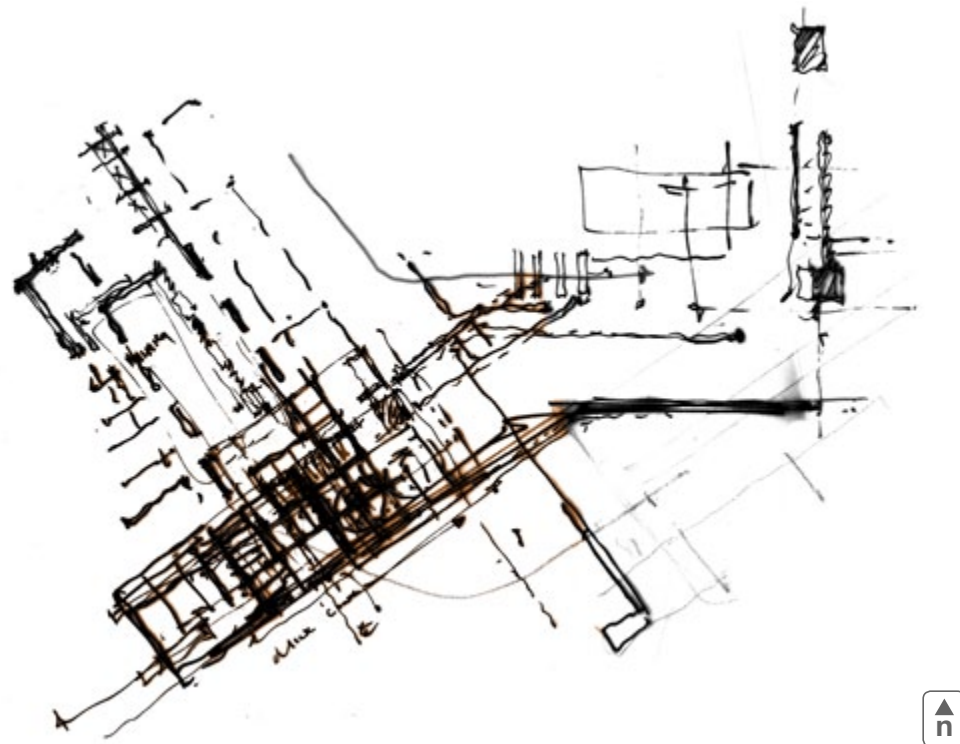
Concept sketch of the milking parlour & milk processing - plan (Author: 2012)
